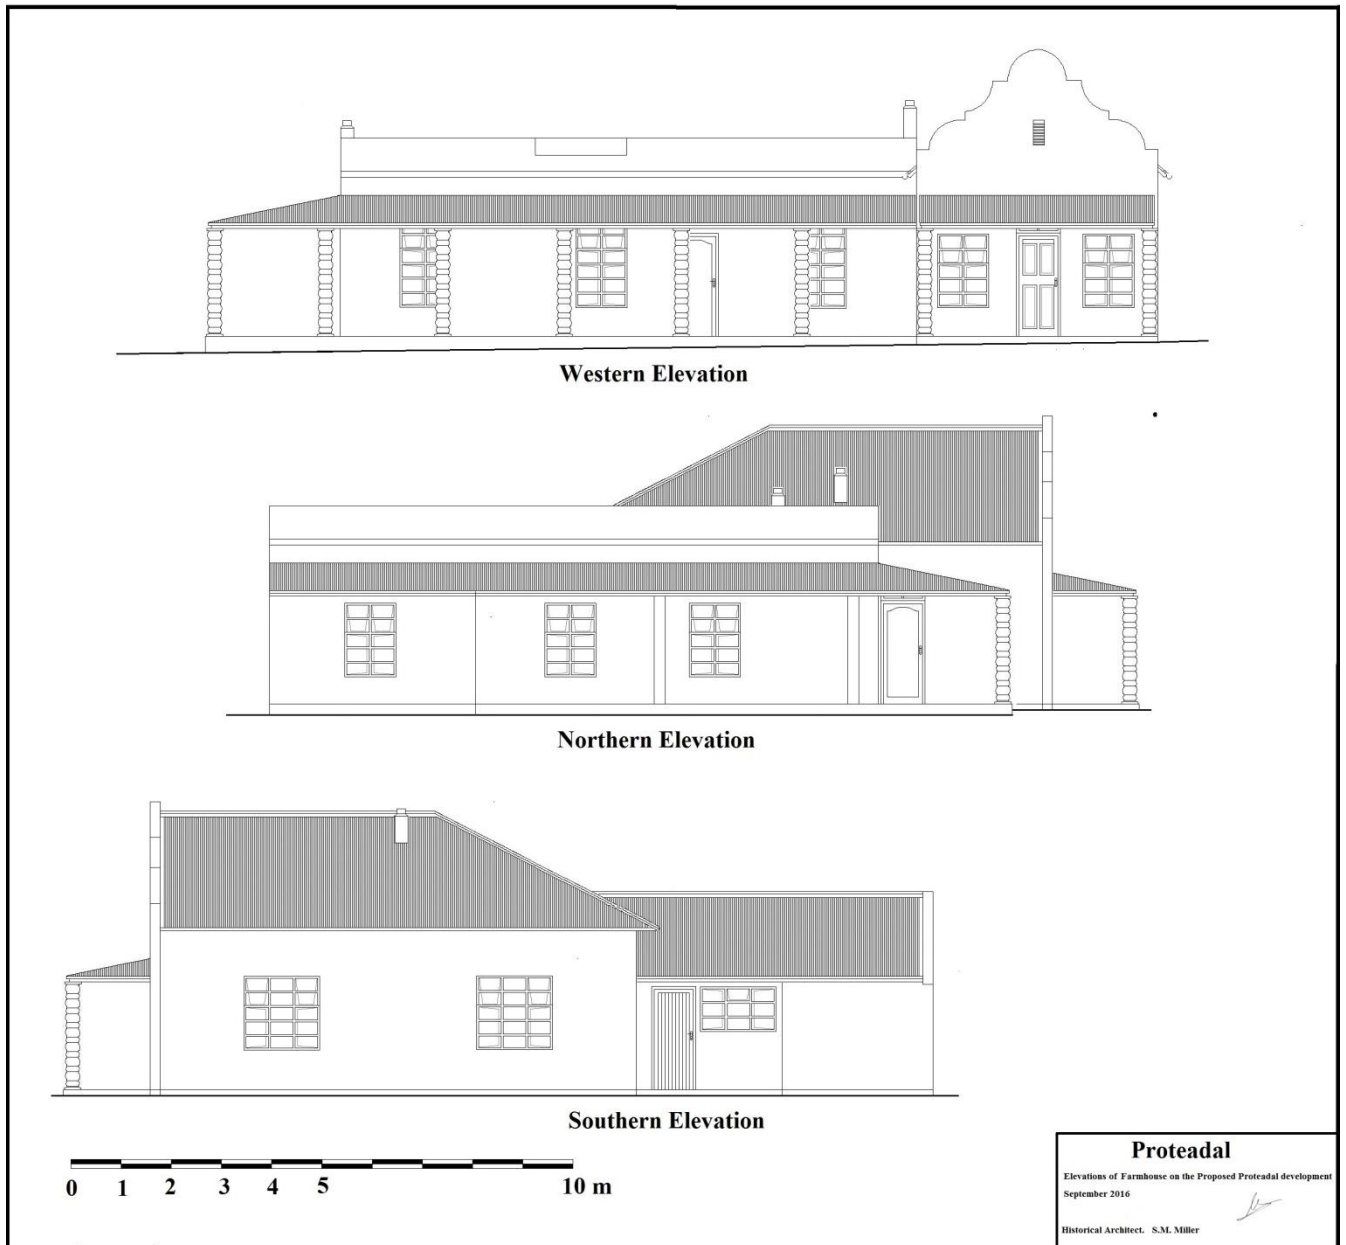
Elevations of the dwelling as recorded in 2016. (Drawing S.M. Miller.)²¹
